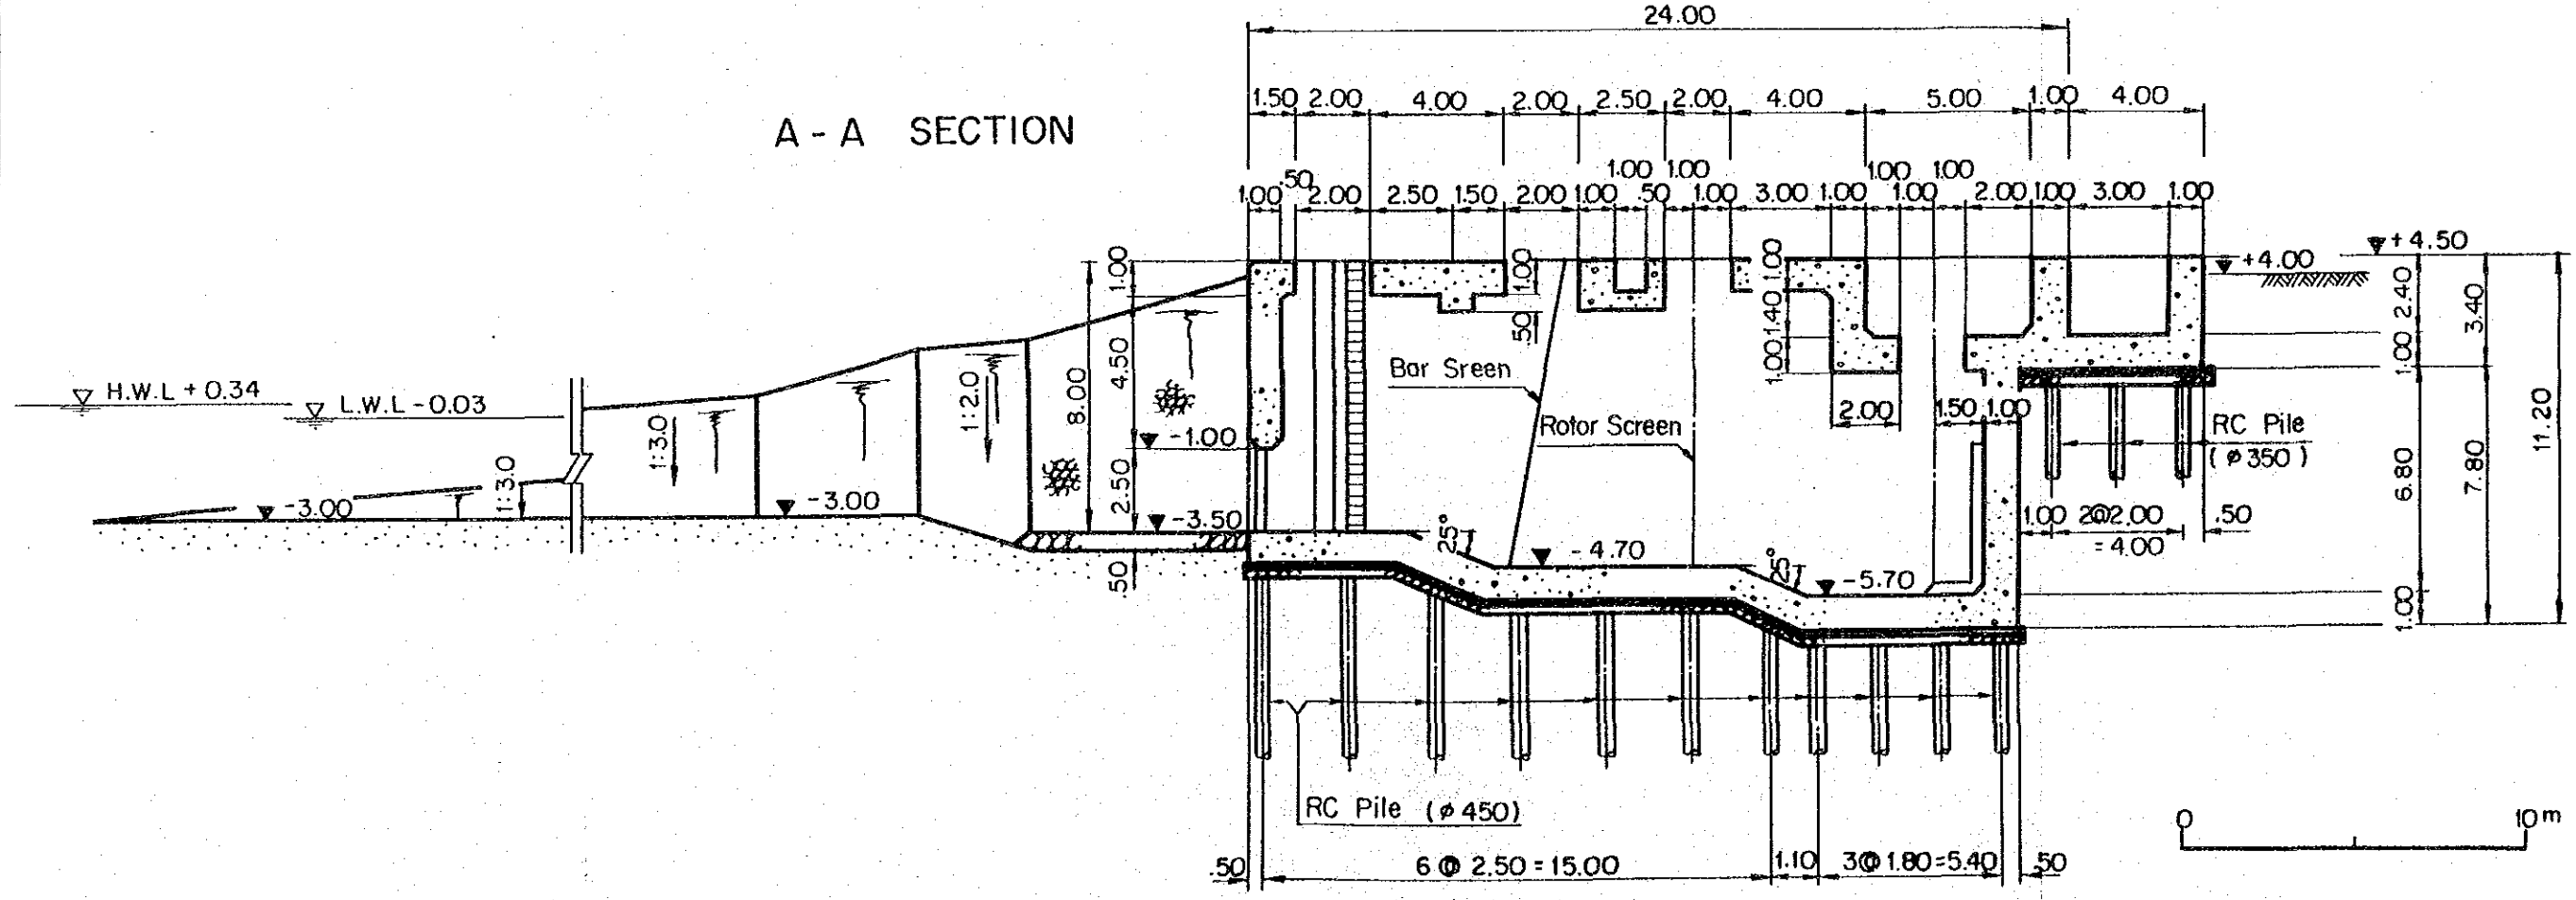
(2) Section of C.W. Intake and Pump Pit
